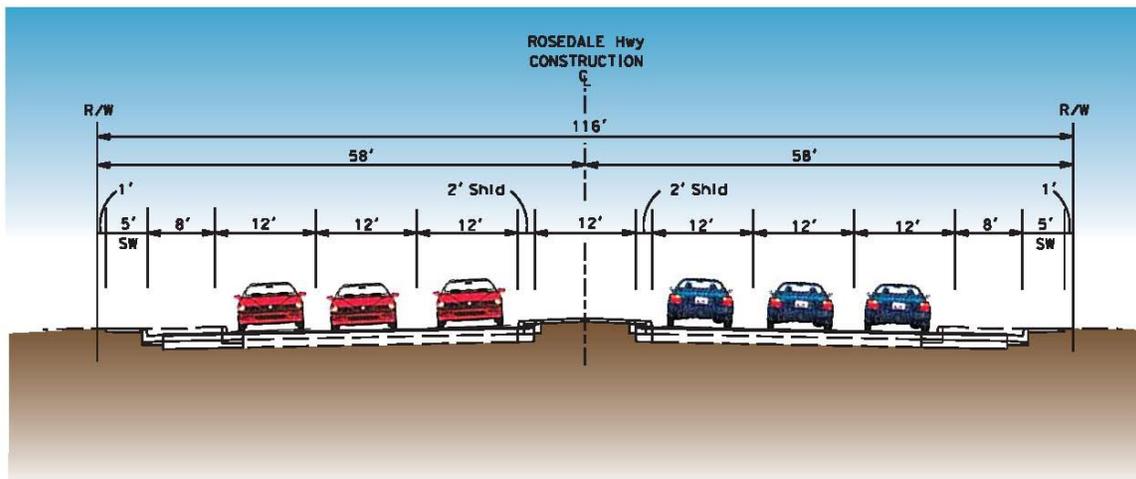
Roadway Design Features from Mohawk Street to Gibson Street
